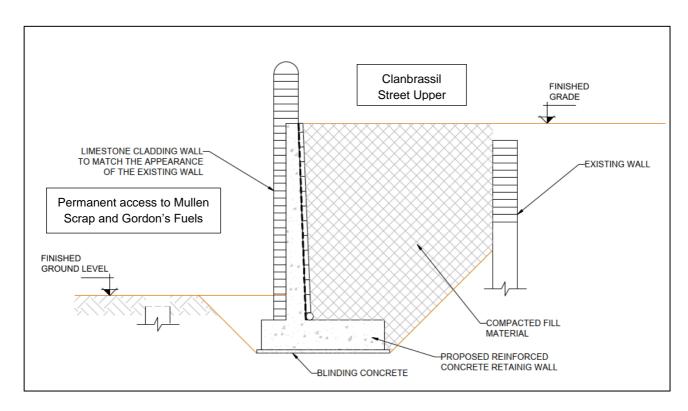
Cross Section Through Proposed Access and Retaining Wall at Gordon's Fuels and Mullen Scrap
